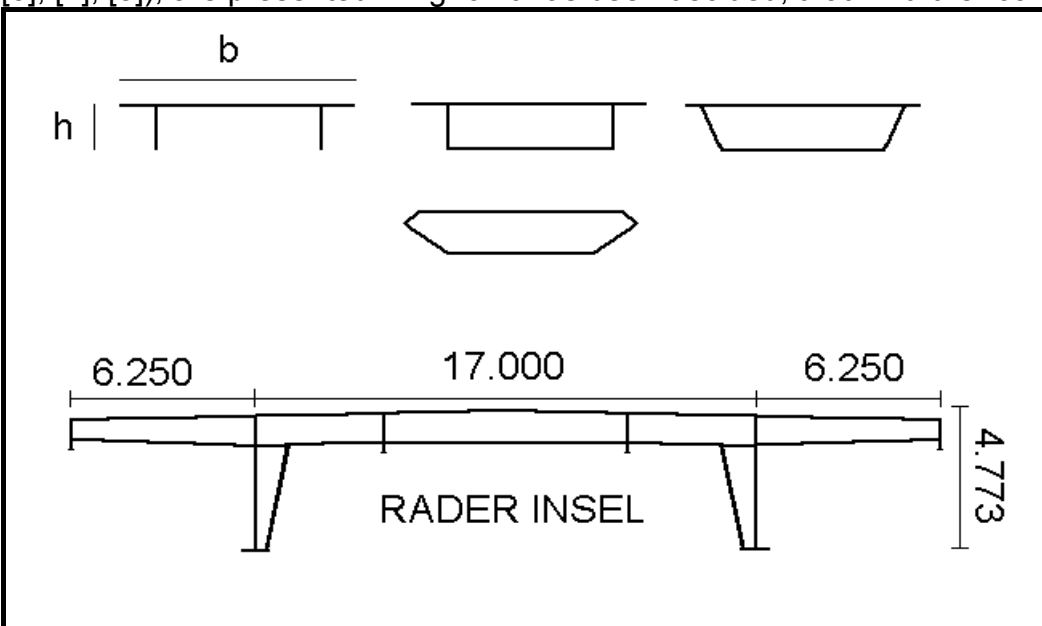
Typical cross-sections of bridge decks and the Rader Insel bridge deck
